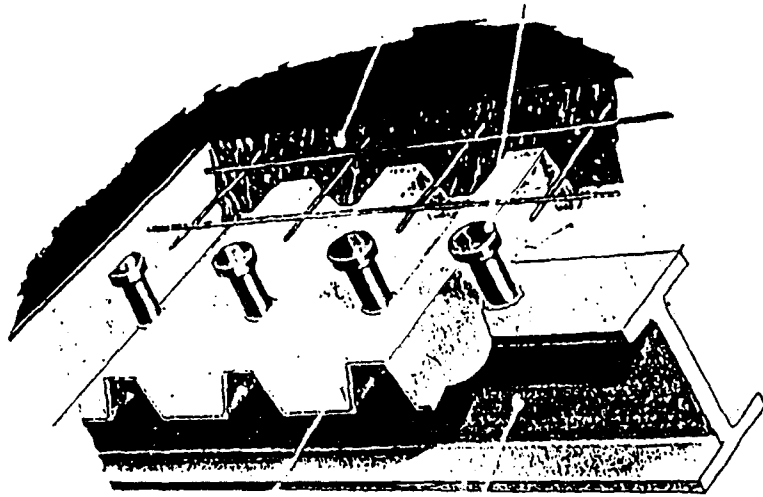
Cposite beam to provide a permanent form for concrete, allow less reinforcing steel, speed construction and eliminate the need for shoring. Studs can be welded directly through the deck to the beam
